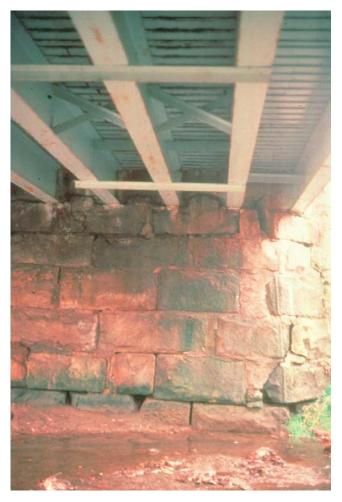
Deteriorated Stone Masonry Abutment
